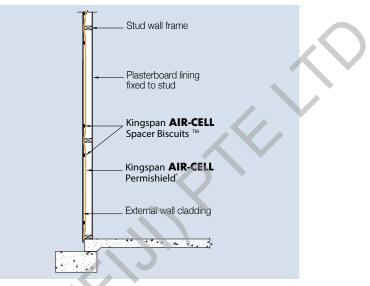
Side elevation of Kingspan AIR-CELL Permishield<sup>®</sup> on steel-framed wall
